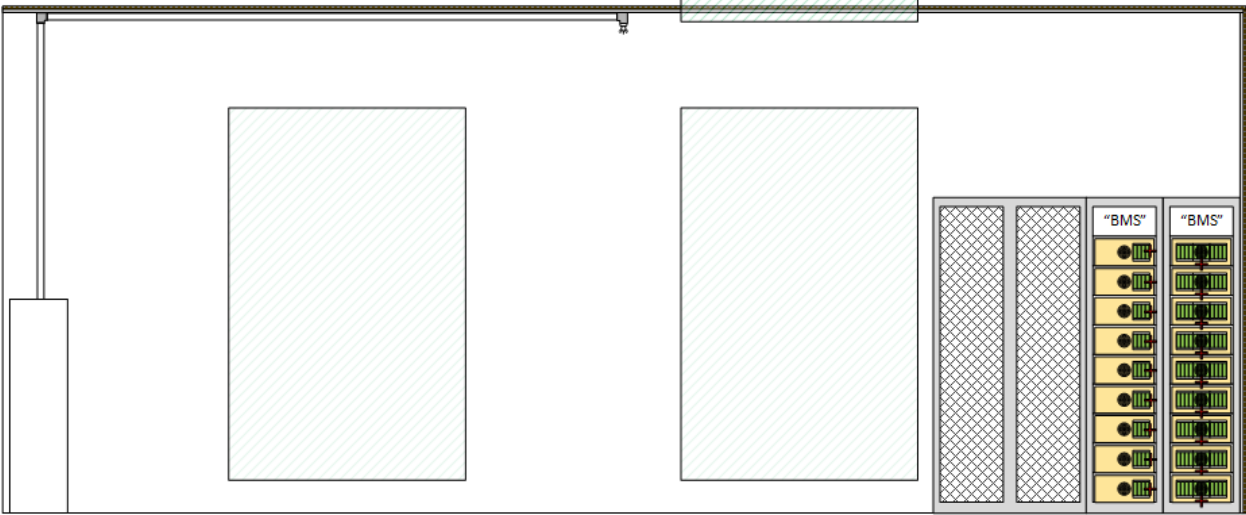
Clean agent piping system to a central discharge nozzle, elevation view.
